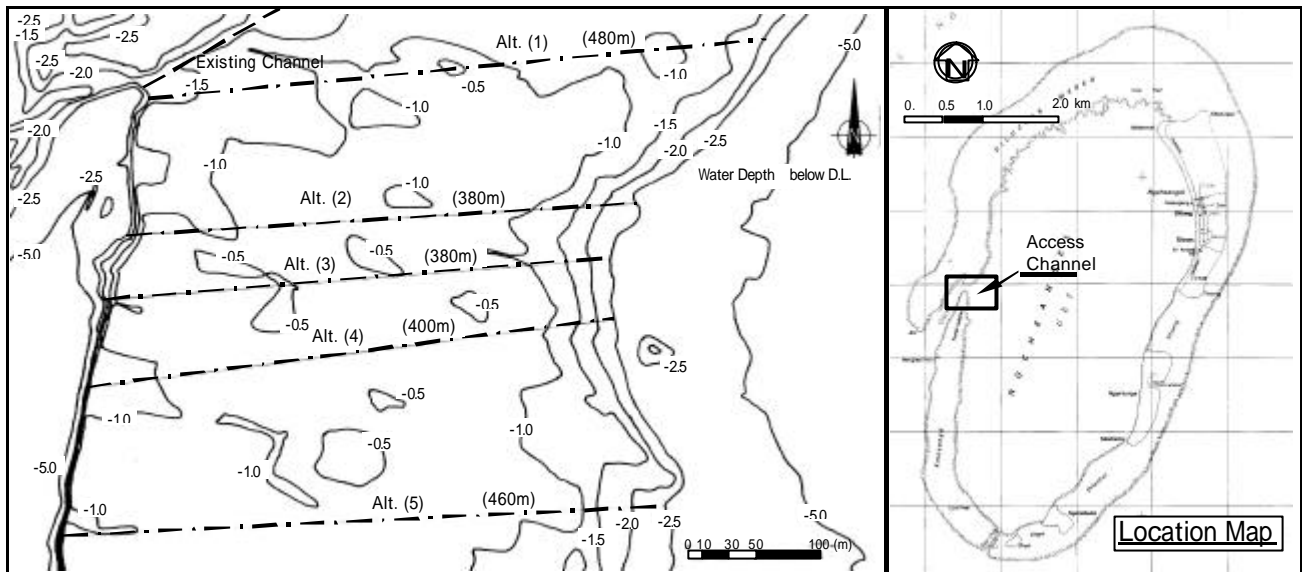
Alternatives of Access Channel Alignment
